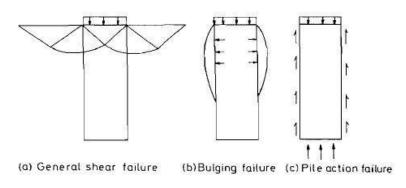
Modes of failure for strip footing supported by granular trench.
